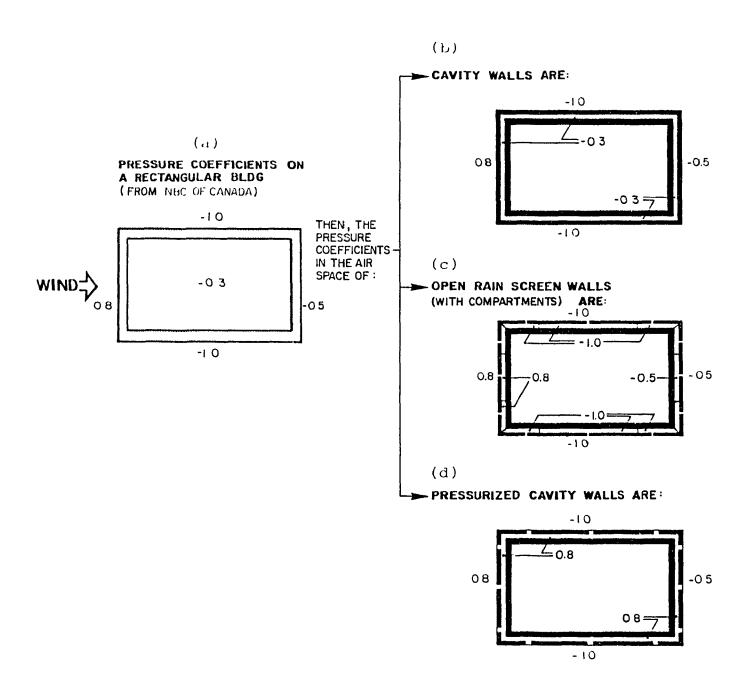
Cavity pressures in cavity walls, rain screen walls and pressurized cavity walls
